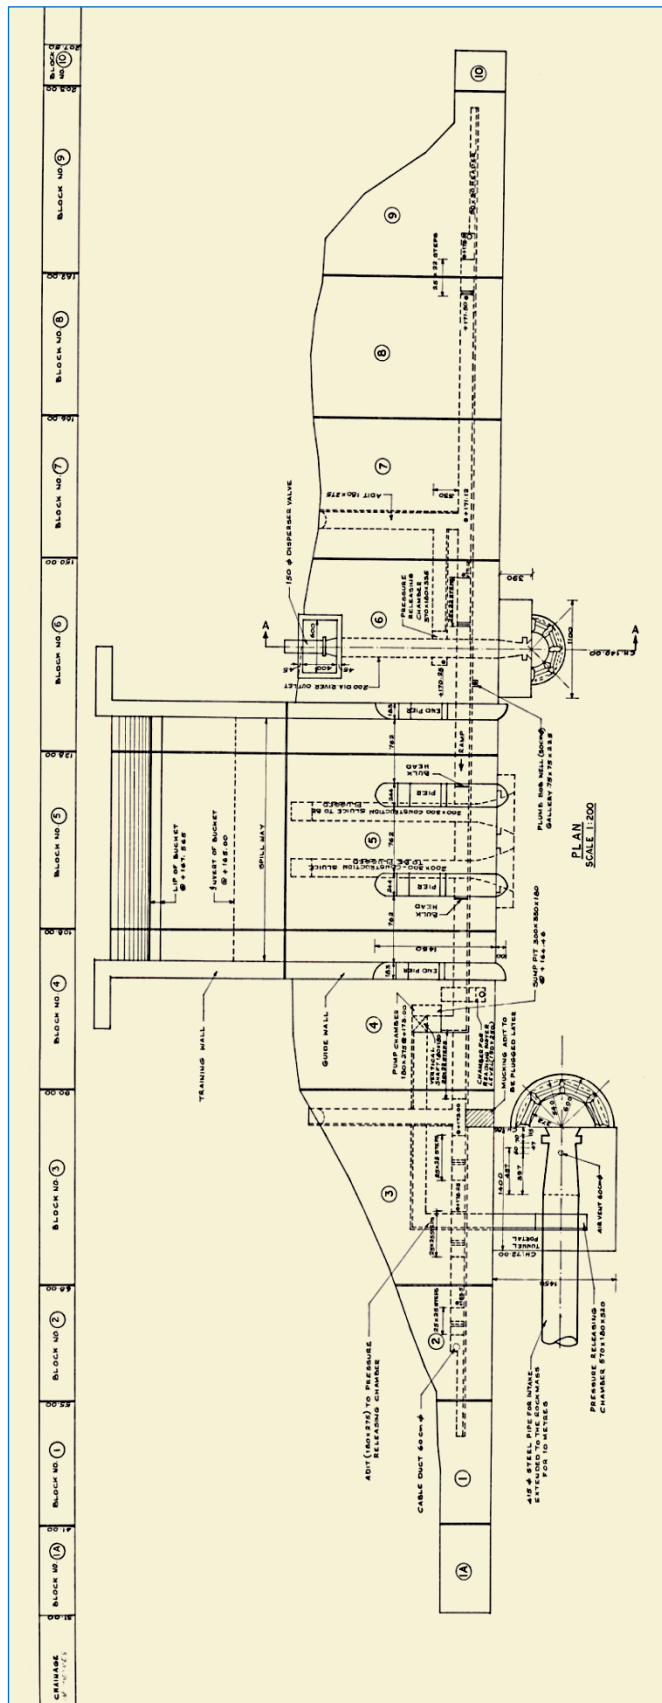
Plan of the dam showing various blocks, spillway, intake & sluice
